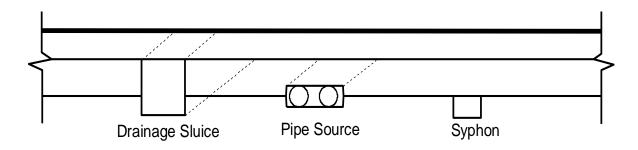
A schematic view of Drainage sluice, pipe sluice and siphon on embankment which relieve drainage congestion.
